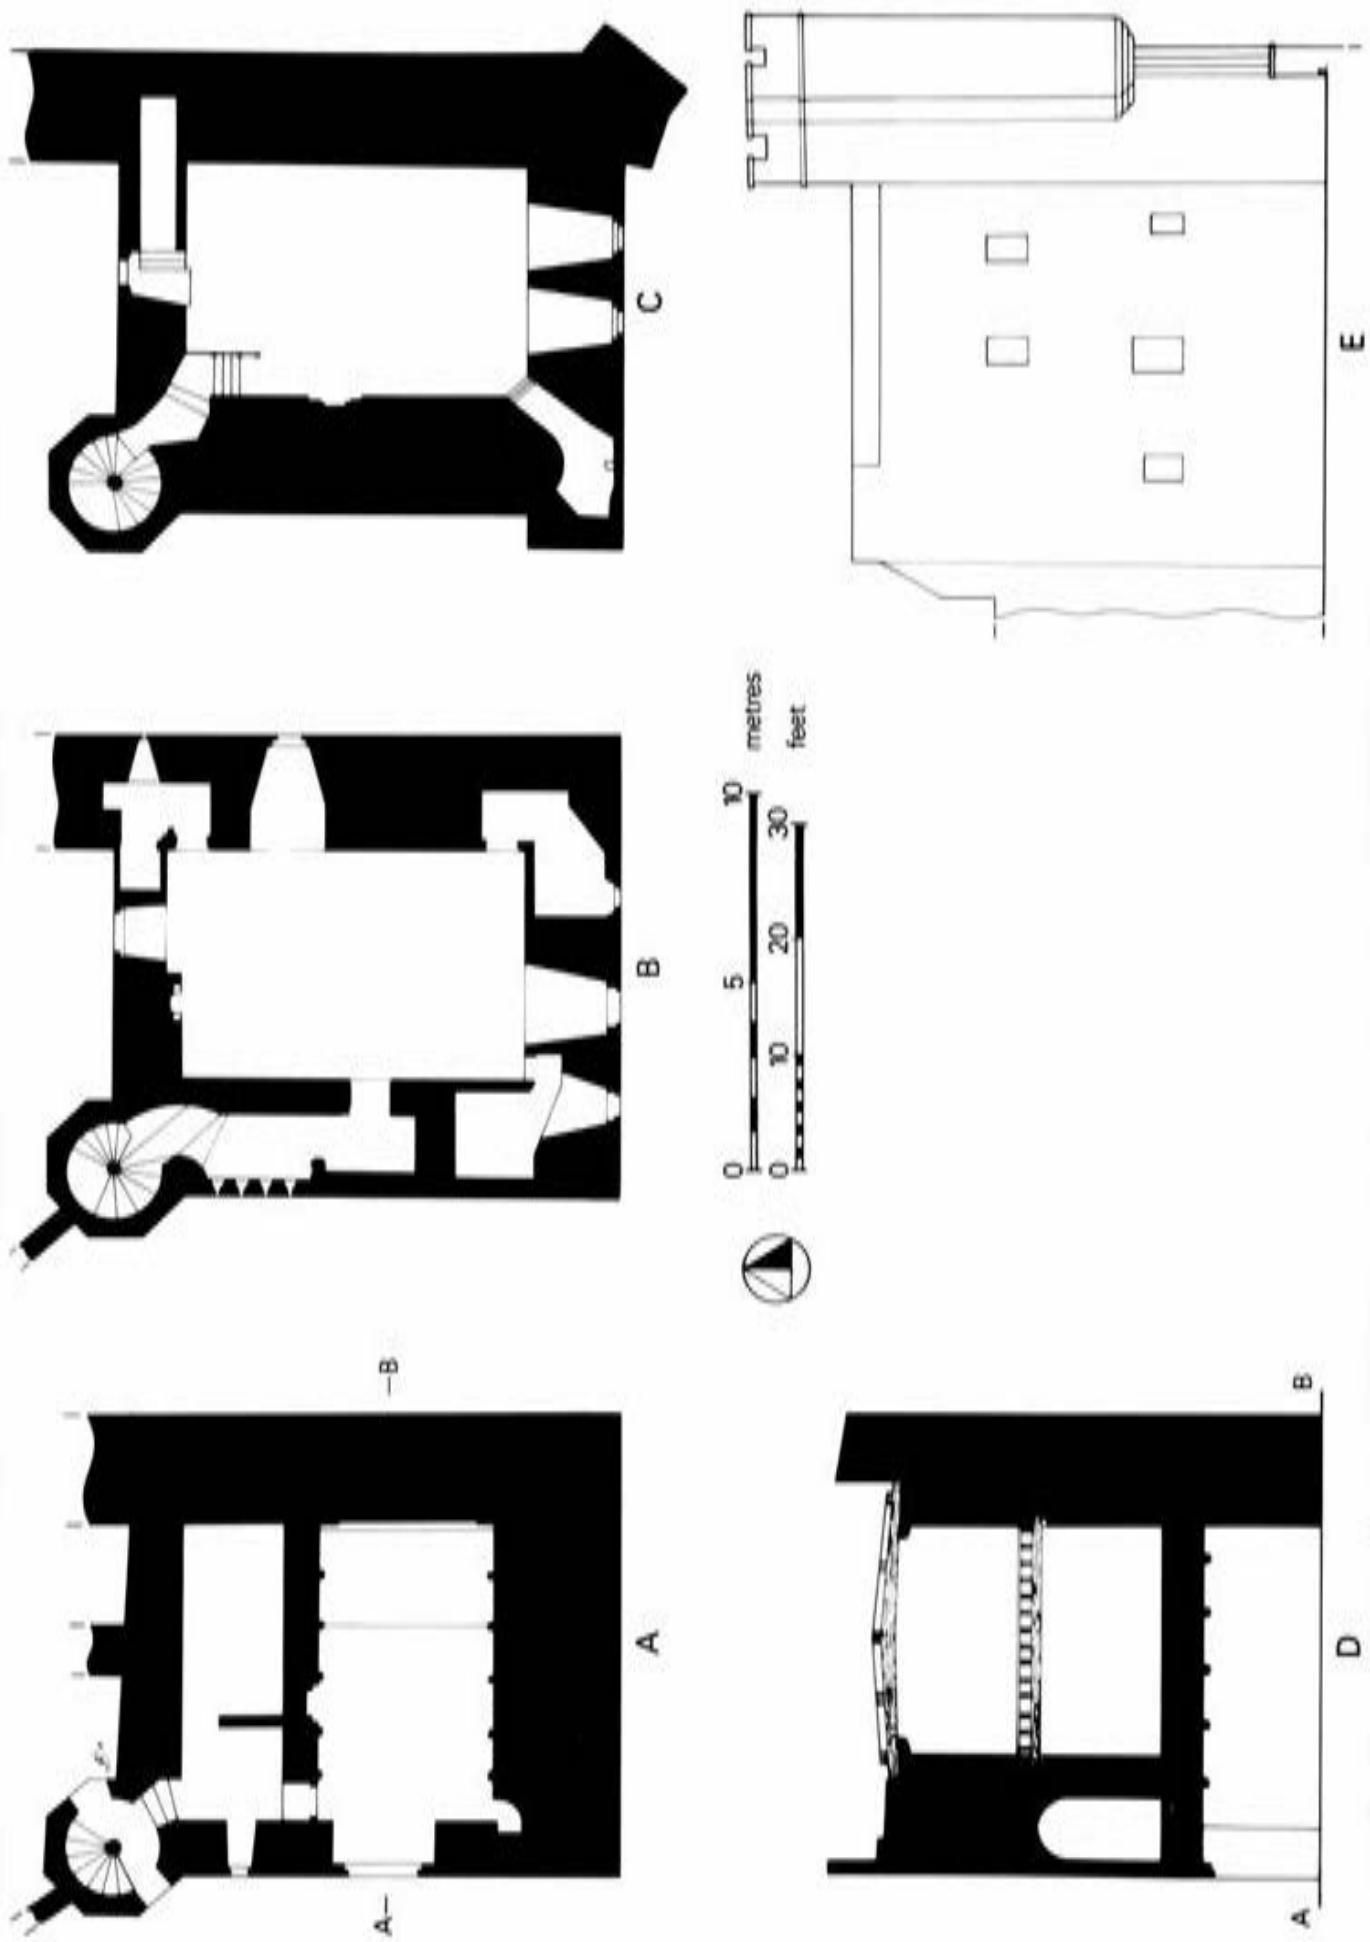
Plans and elevation (after Emery 1834) of Queen Mary's Tower. A ground floor plan; B first floor plan; C second floor plan; D east-west section; E south elevation
